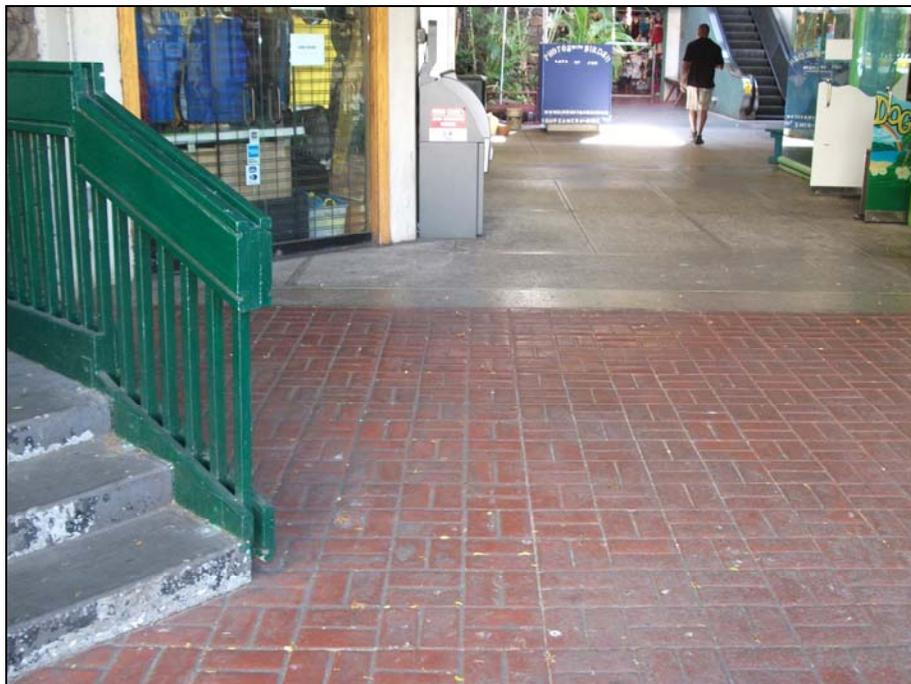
Trench 4, northeast side of campus, central walkway by stairwell, view to west (*makai/'ewa*)
